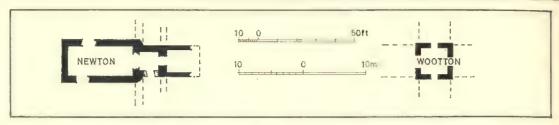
CENTRAL TOWERS WITH INCOMPLETELY DEFINED CHURCH PLANS
